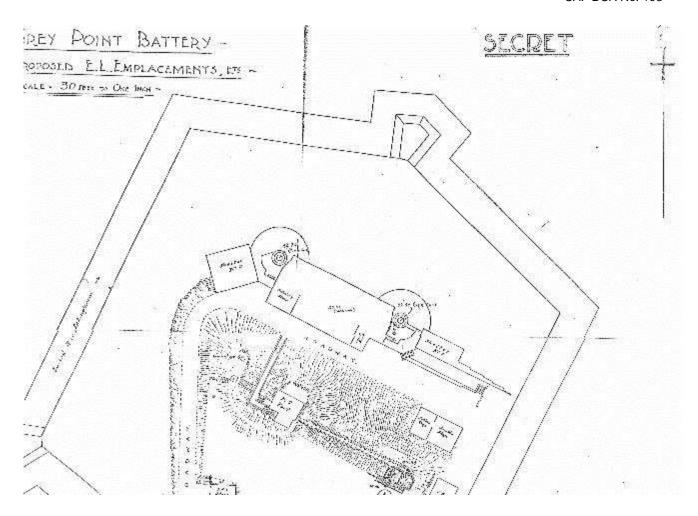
Detail of the 1931-32 plan of Grey point Fort showing the northern Blockhouse excavated in 2014.
